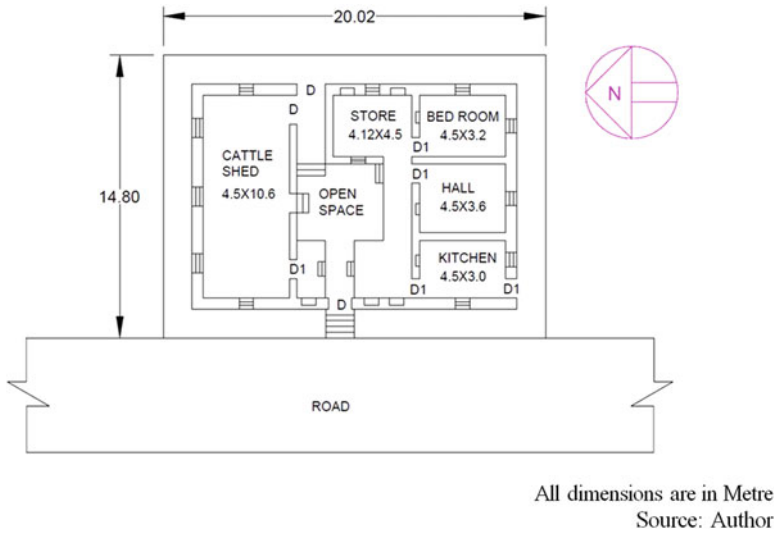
Plan of Raghoba Salunkhe, case study Wada (All dimensions are in meter)
